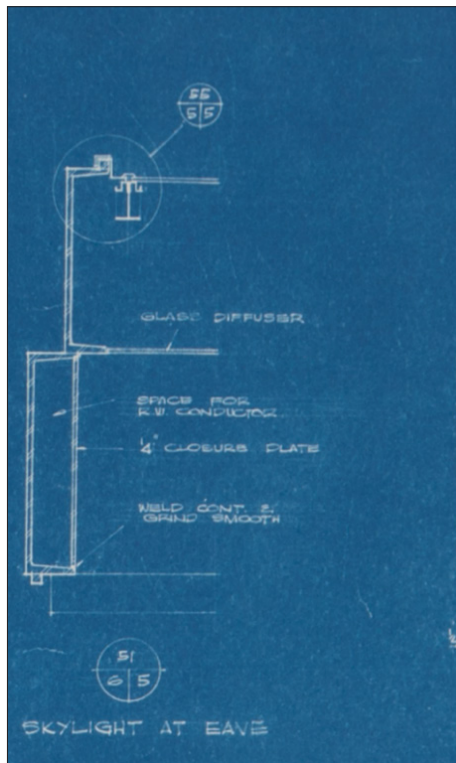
Drawing details of roof assembly, Sheet A5. Detail 51 shows concealment of roof drain. Date: February 18, 1955. Credit: MHG\_IIIa\_FF041\_010, Miller House and Garden Collection (M003), Newfields Archives
